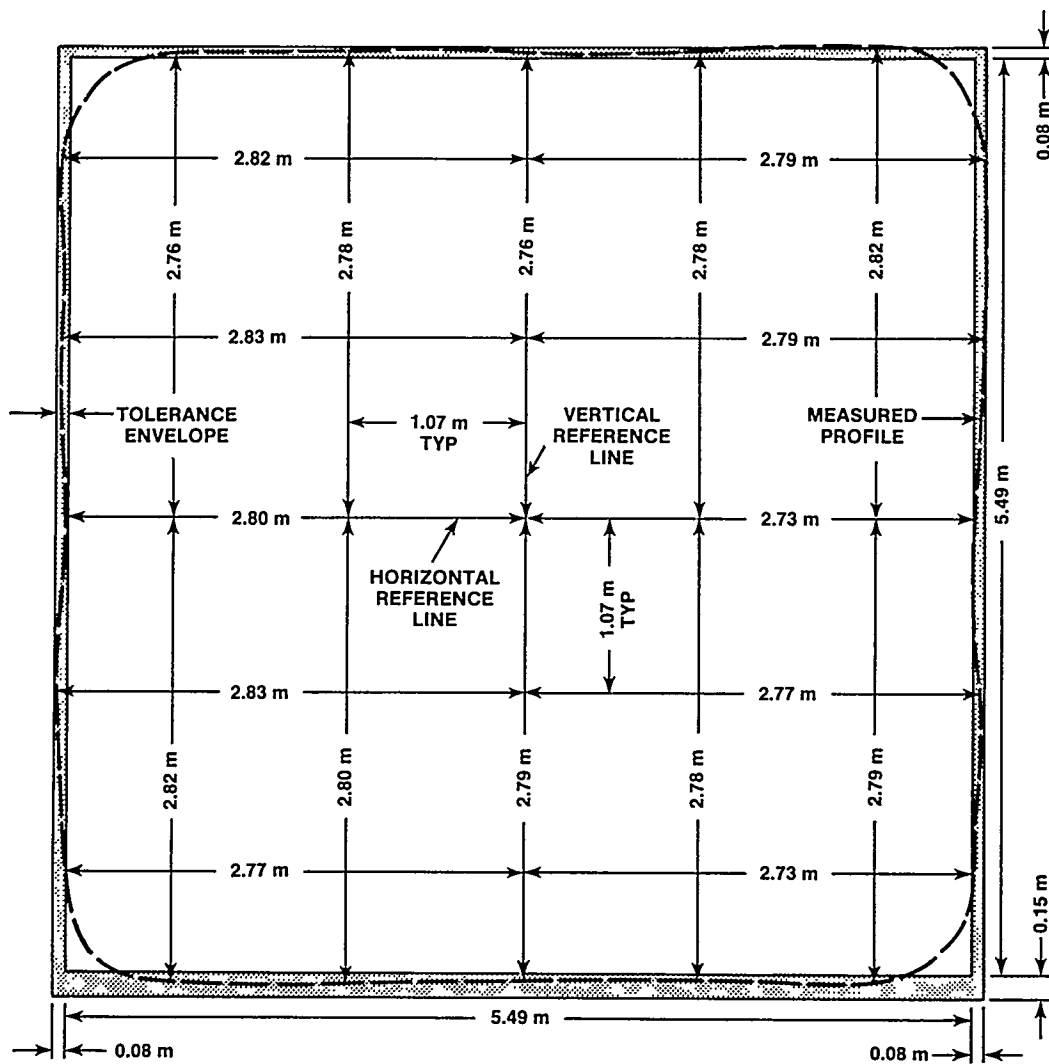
As-Built Cross Section of Station +15.8 m, Room A2
